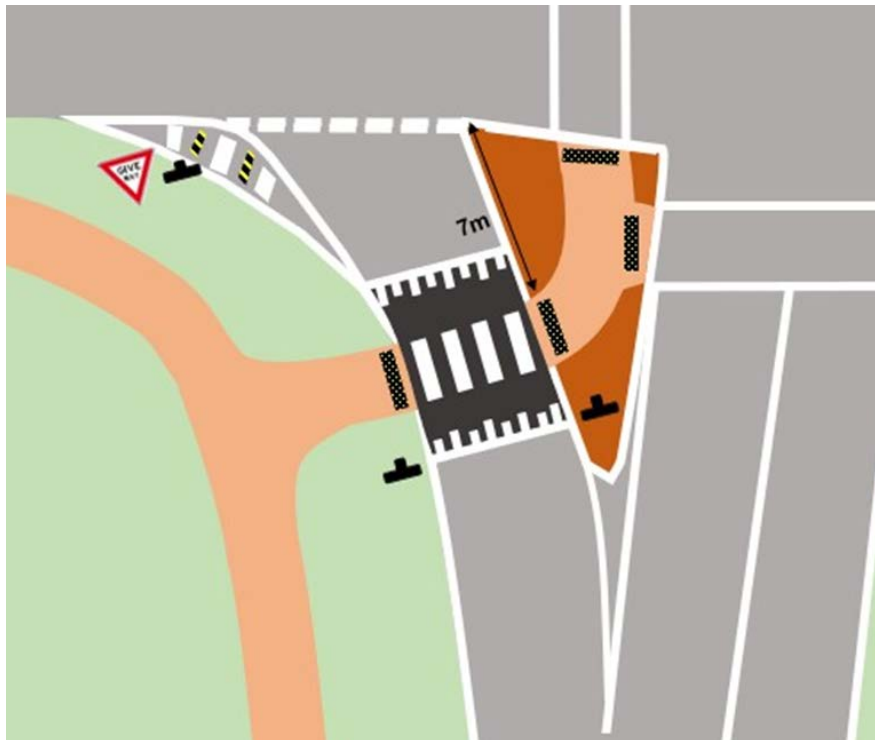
(a) – Raised crossing treatment on slip lane, Entertainment Road, Oxenford, Qld
